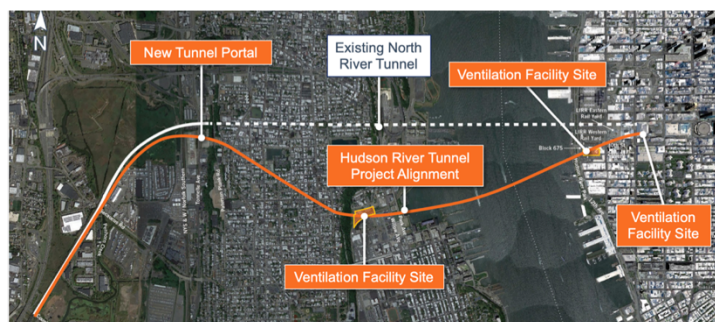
Proposed alignment of the new Hudson River Tunnel and approach structures as well as the location of the existing tunnel. (Courtesy of GDC)
